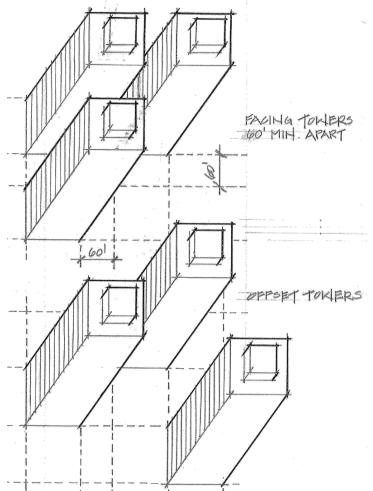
Offset Towers: Space towers at least 60 feet apart for light, air and privacy. It is preferable to offset towers for added privacy and to provide distant views.
